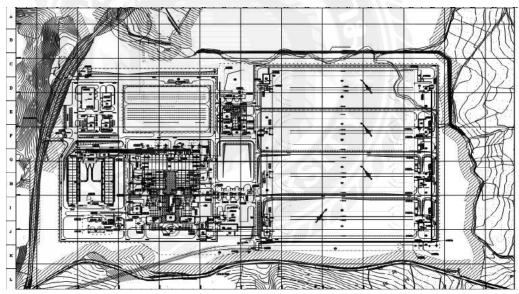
Plan layout of Turkish SOMA thermal power project
